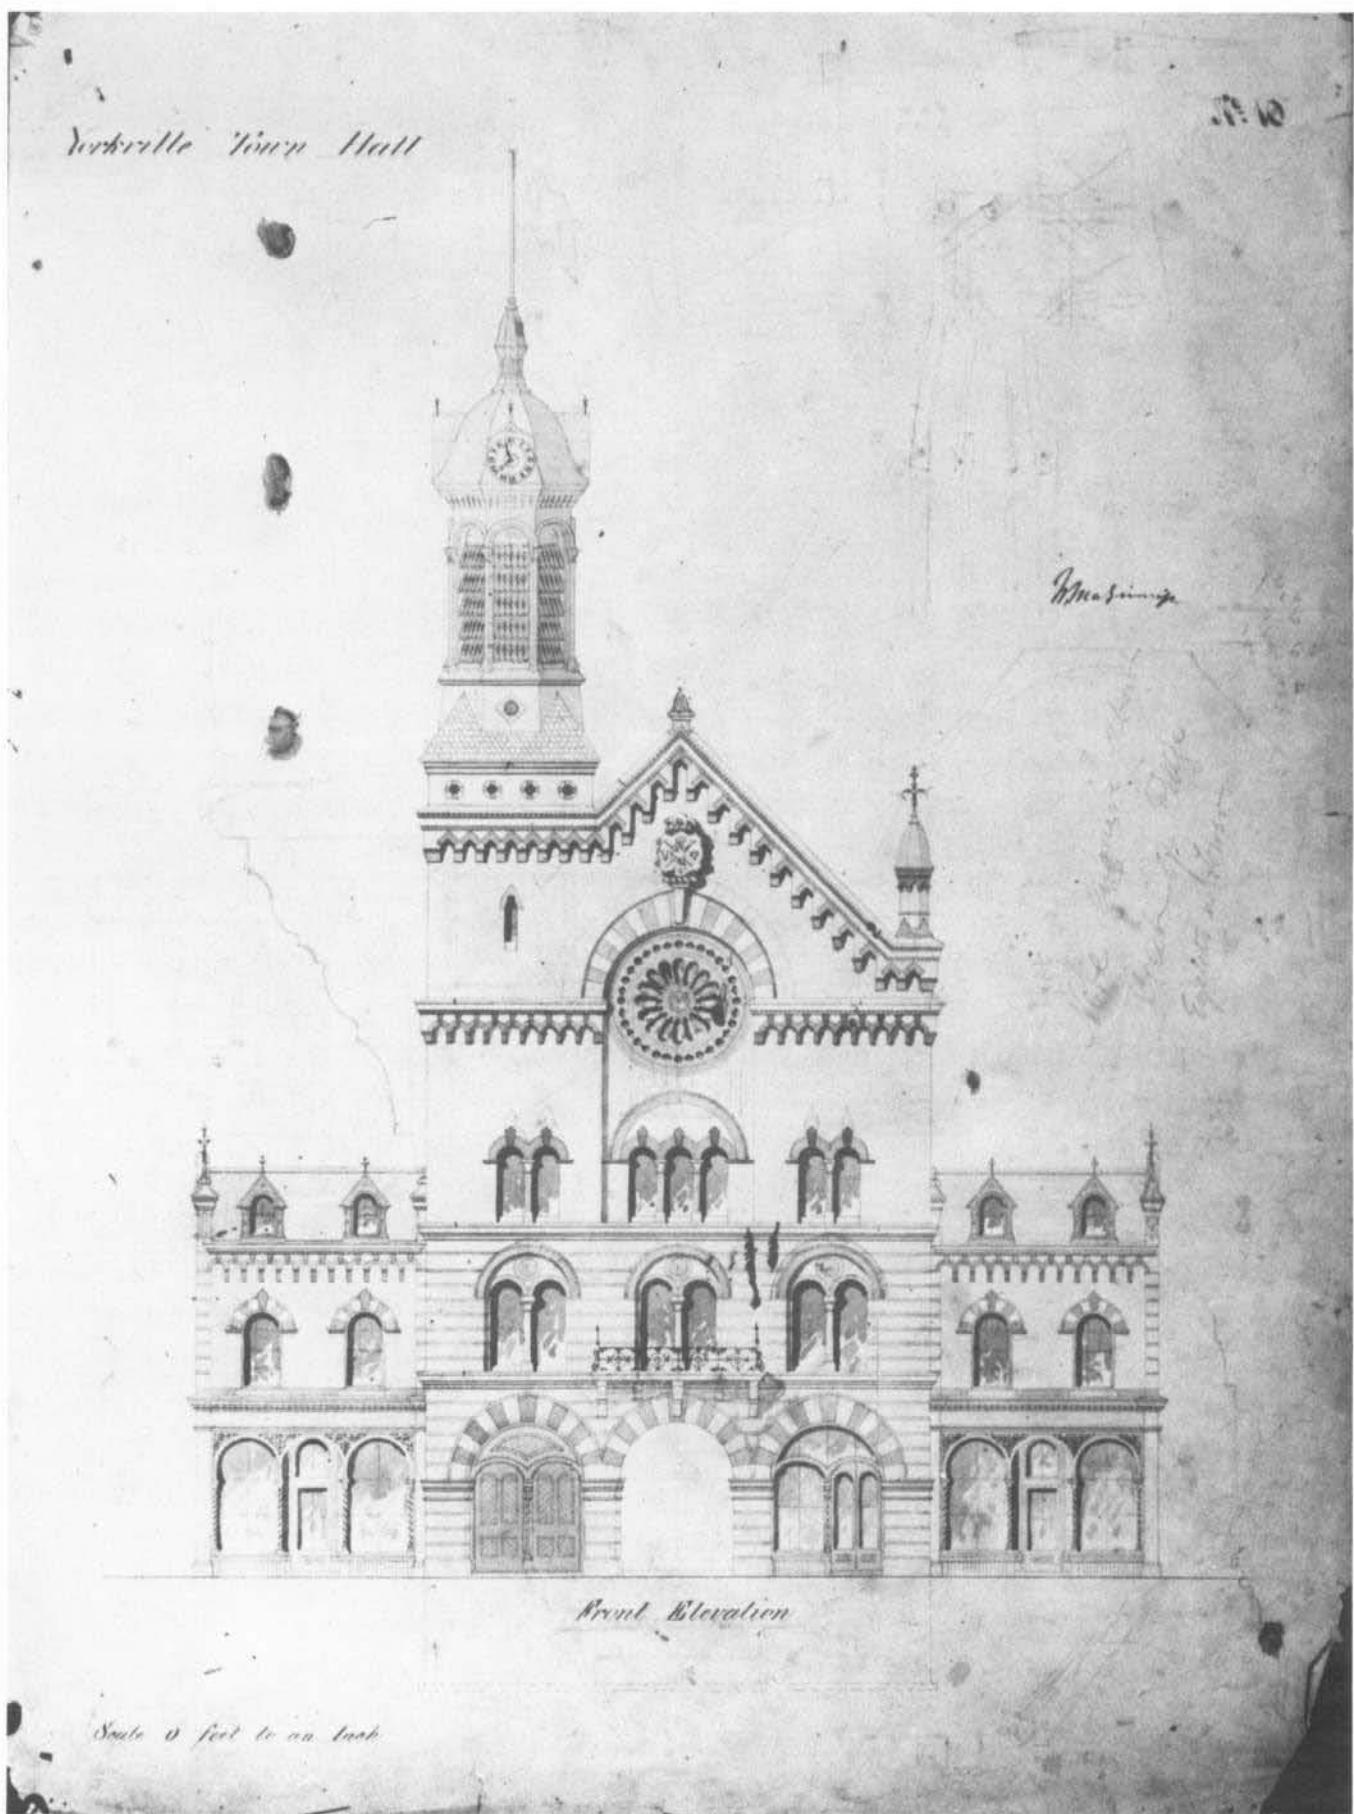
Plan for the Yorkville Town Hall, principal facade (nearly as built). (Photo: Langley Coll., Metropolitan Toronto Library Board)
